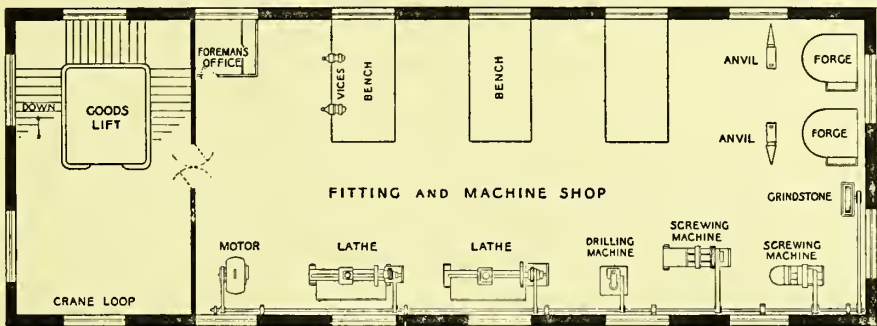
Second-floor Plan, showing Workshop, &c.
